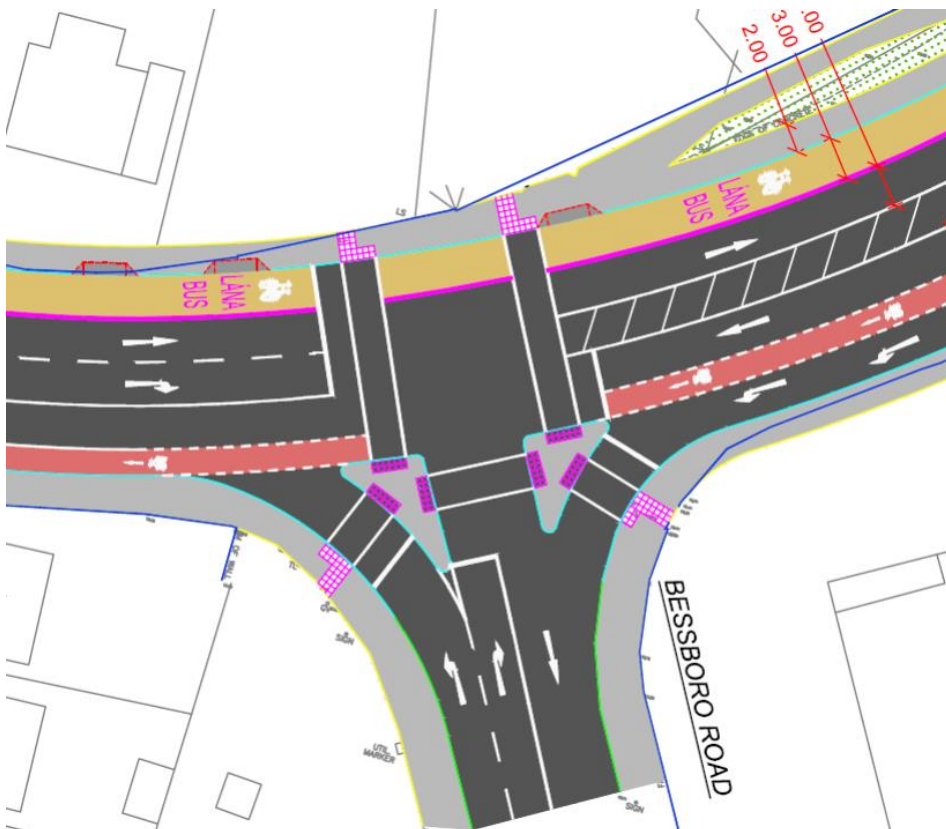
Skehard Road/Bessboro Road Proposed Junction Upgrade Layout
